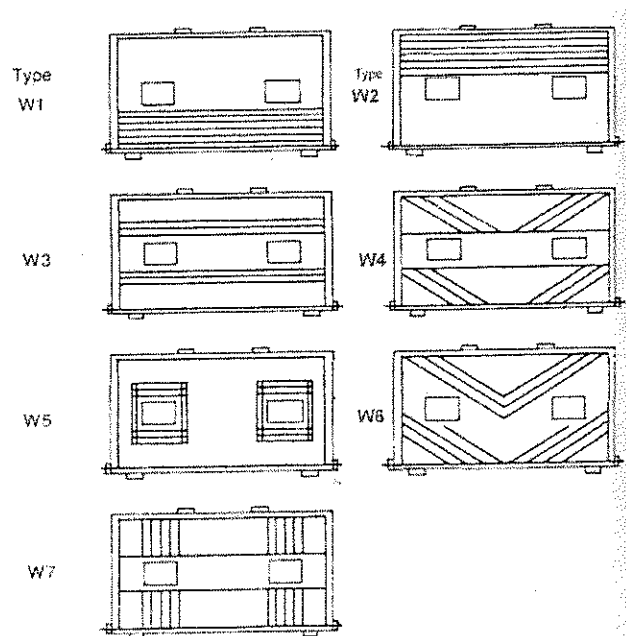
Reinforcing layouts for experimental beam specimens.
